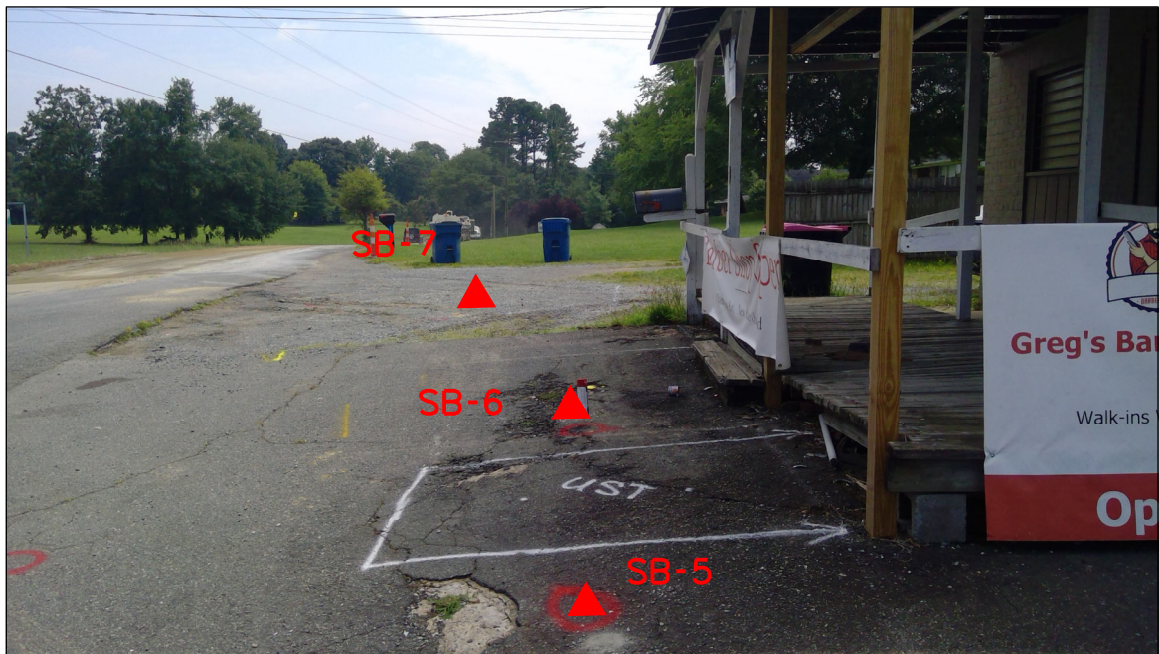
VIEW OF SOIL BORING LOOKING SOUTH
